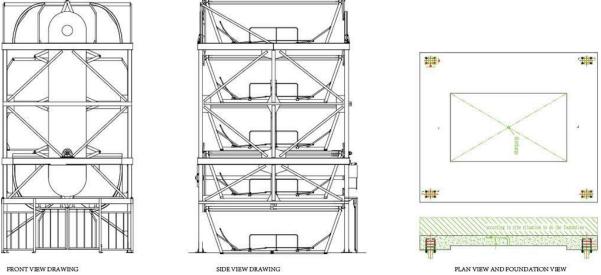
Front view, side view and plan view of the RACPS (Source: www.asiaparking.co)
